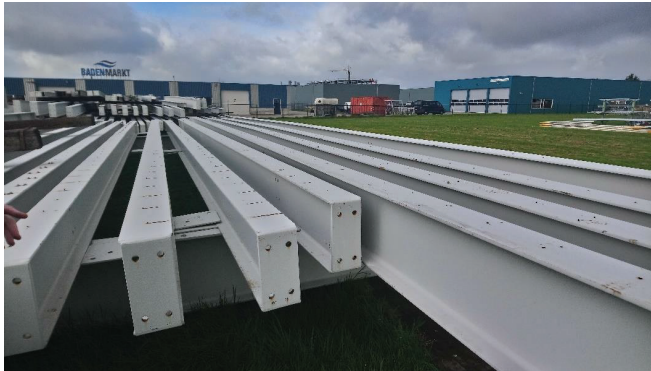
Circular steel inventory acquired through deconstruction of a warehouse - site visit Kampstaal 24/10/2018
